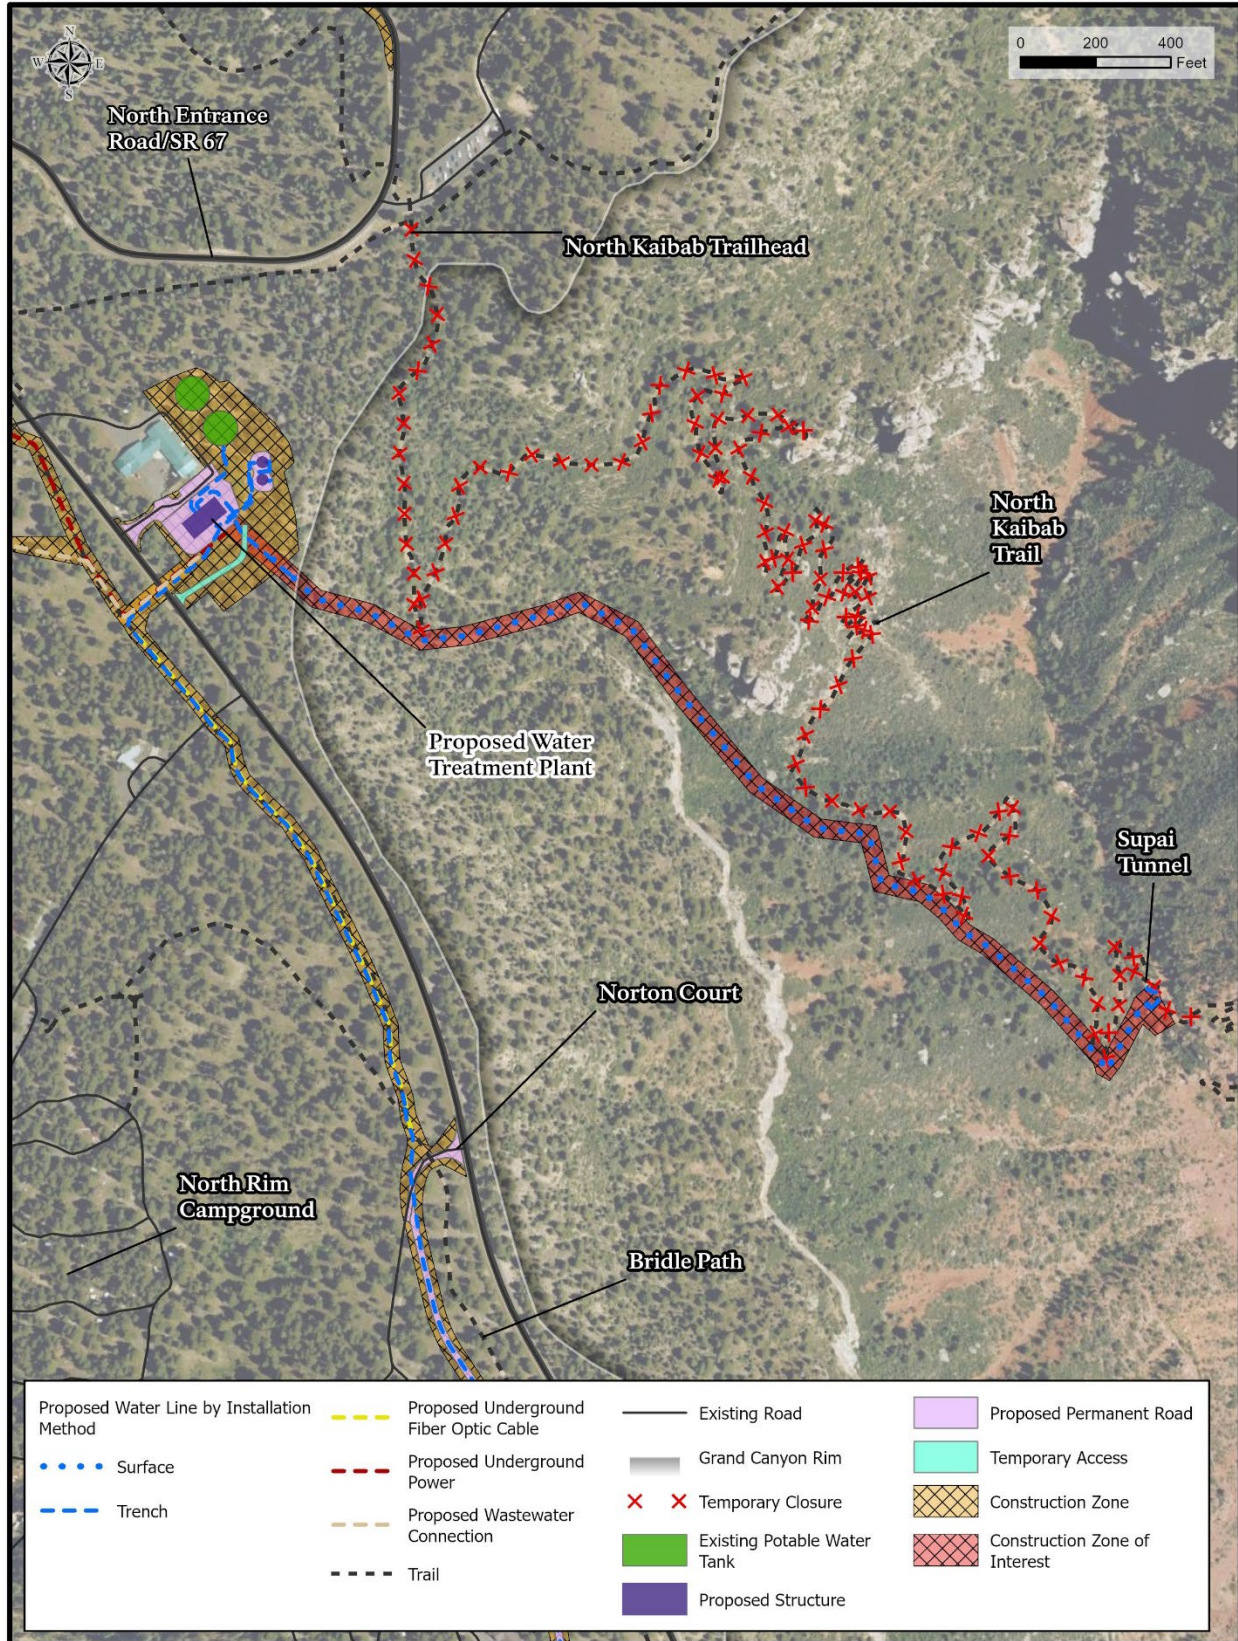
Waterline Area 4 Construction Zone, including Supai Tunnel
